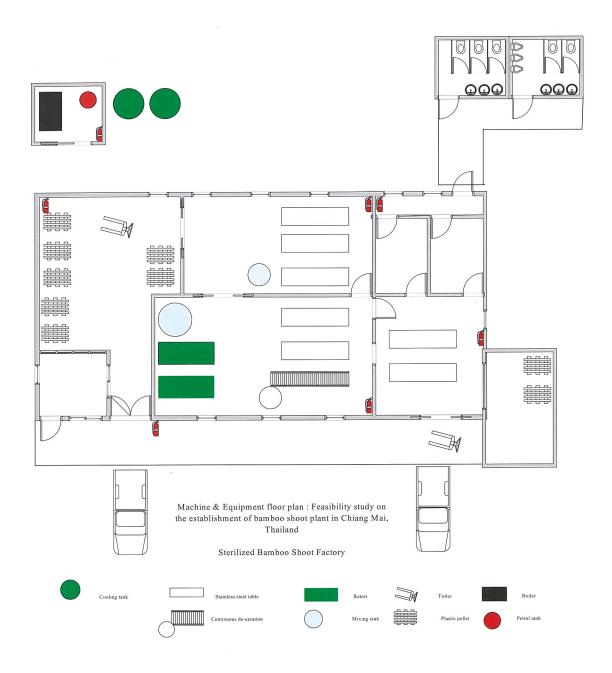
Floor plan for machinery and equipment of sterilized bamboo shoot factory.
